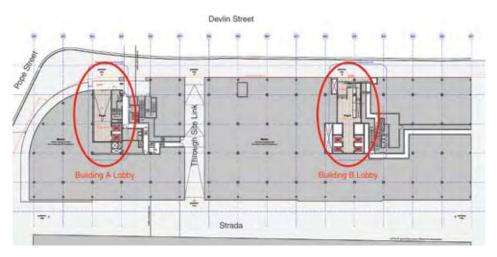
Pedestrian Access Points from the Ground Floor/Devlin Street
